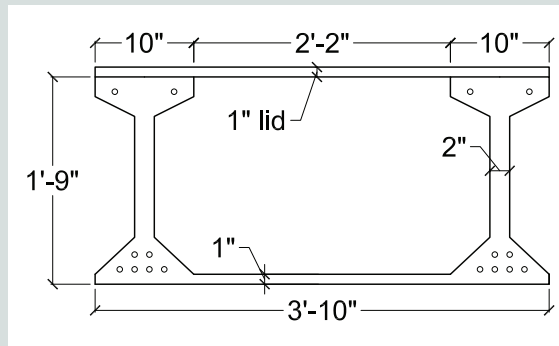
Cross section of building floor slab produced by Tindall Corp. Note: 1" = 1 in. = 25.4 mm; 1' = 1 ft = 0.305 m.
